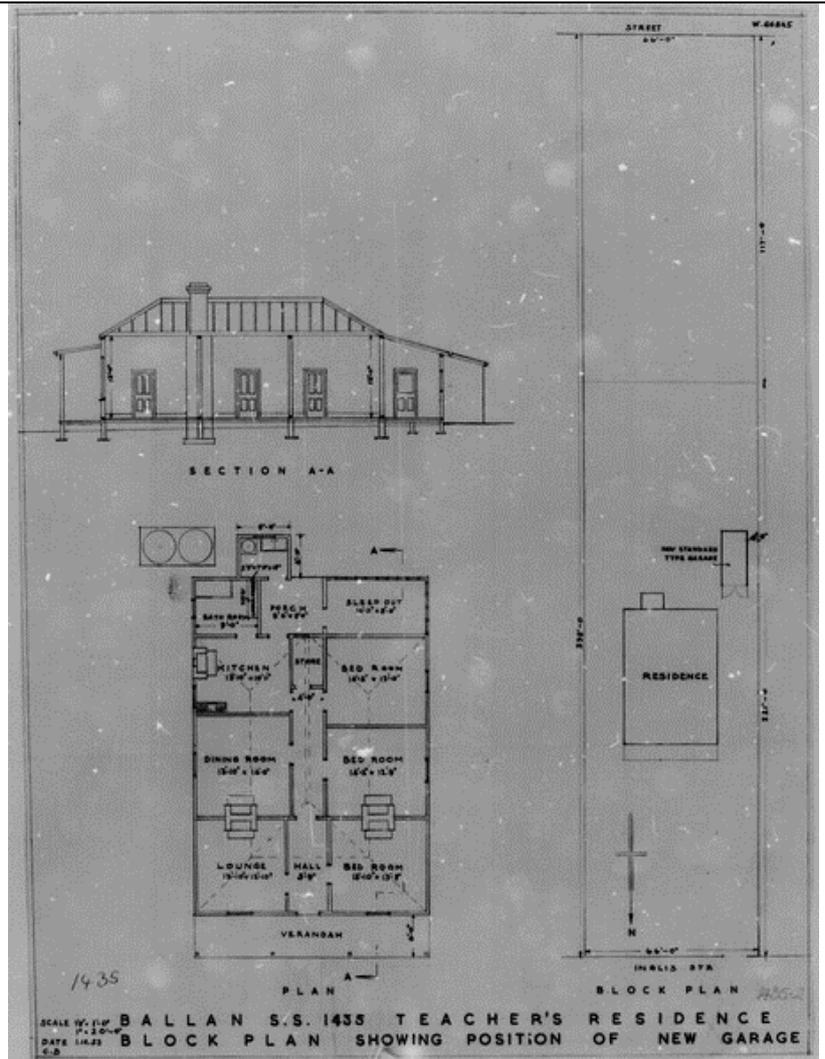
Floor plan, section A-A and block plan of 'Everleigh', 1 October 1953.
